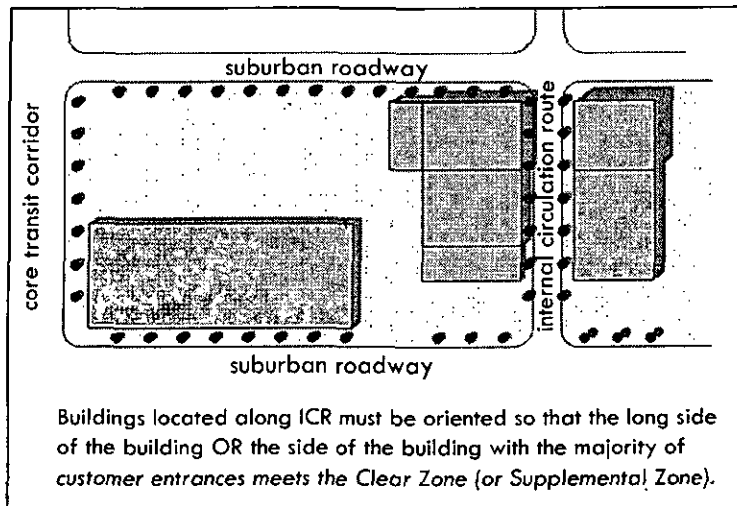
For sites of five acres or more, buildings may be located along the internal circulation route, instead of the core transit corridor.
